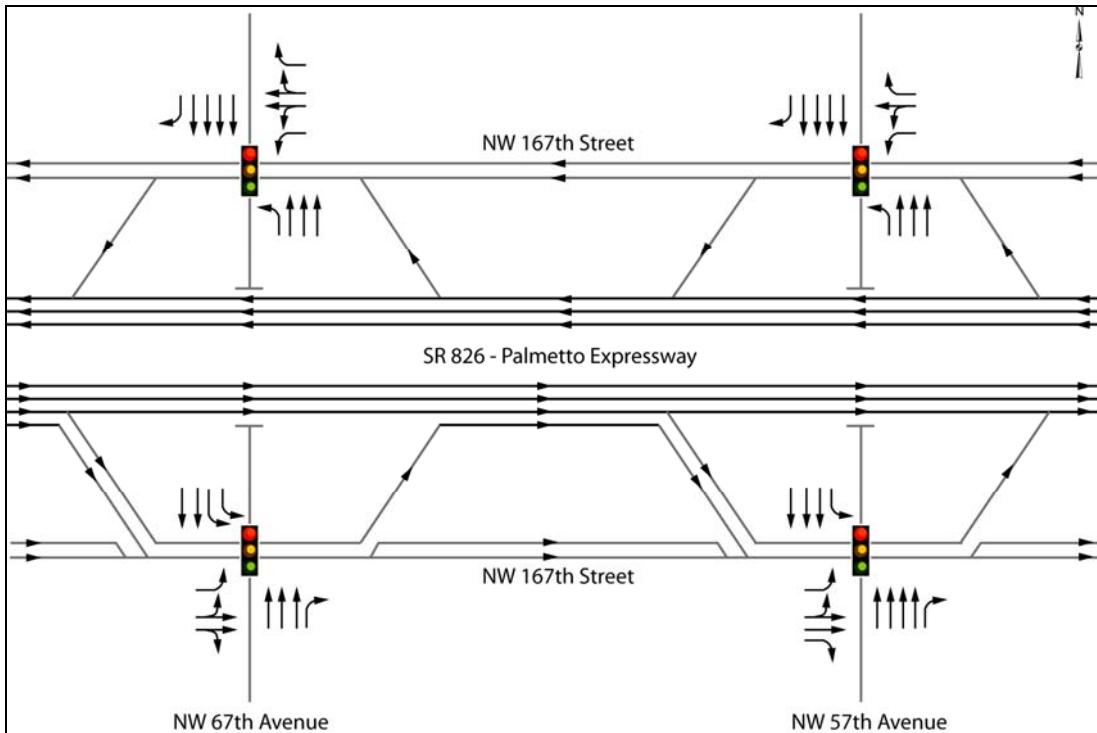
Existing Conditions Geometry (EB Improvement Project Post-Construction)
